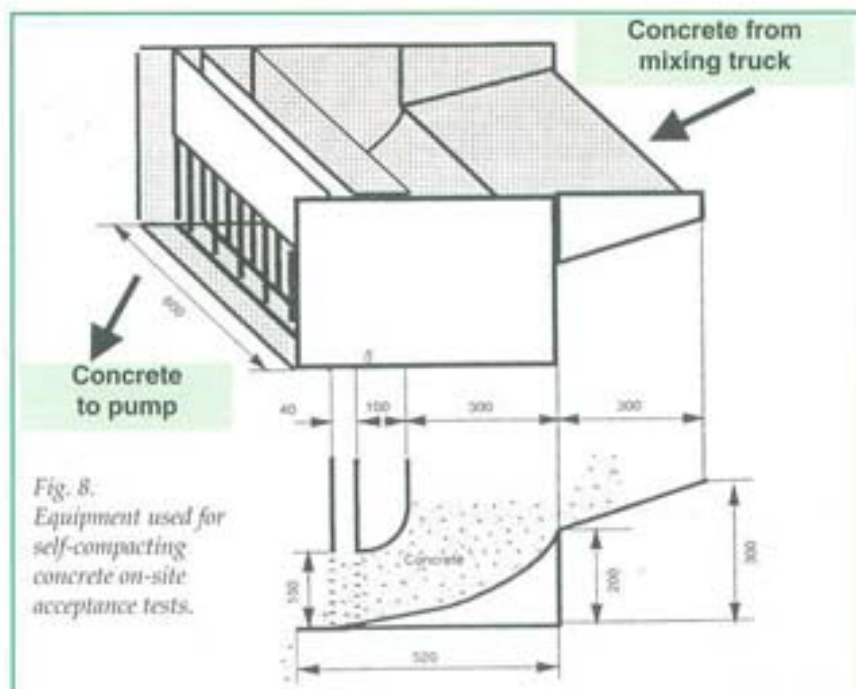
Equipment used for self-compacting concrete on-site acceptance tests.
